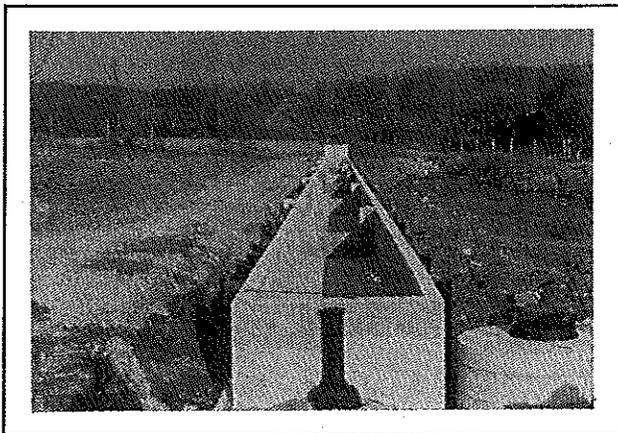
Construction of a new raceway at the Kettle Moraine Springs Hatchery. Raceways like this are used to house steelhead.
